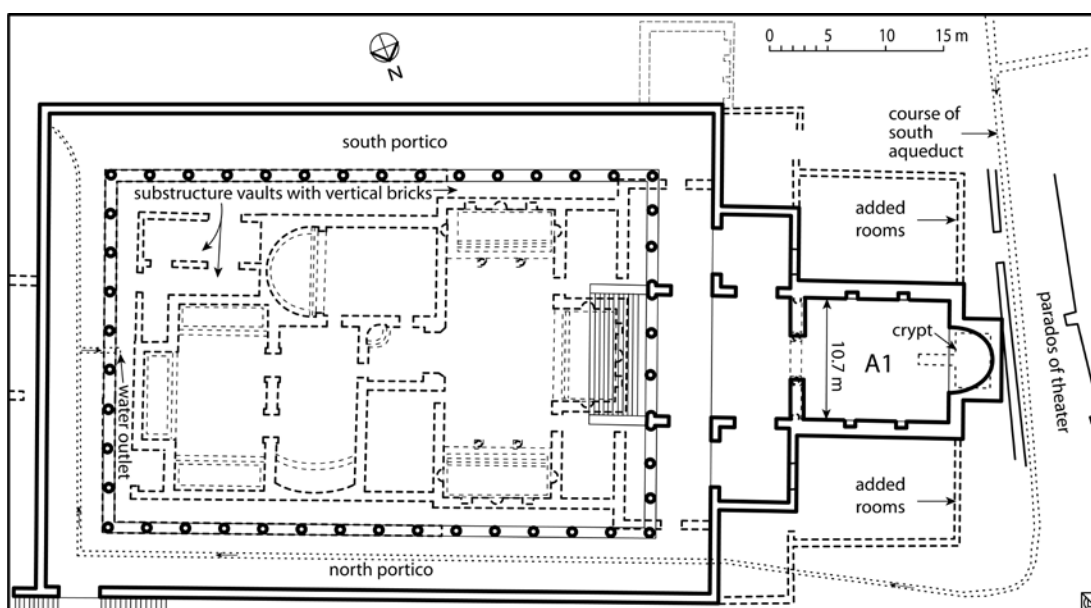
Argos. Plan of cult building later turned into the bath complex known today as Bath A. Dashed lines indicate bath complex built into courtyard of cult building.
